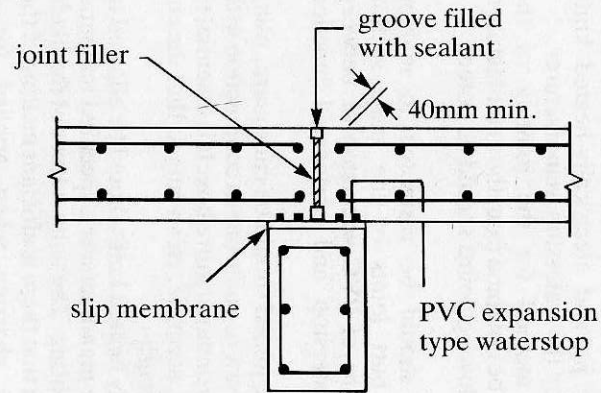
Typical intermediate expansion joint in roof or roof to division wall sliding joint
